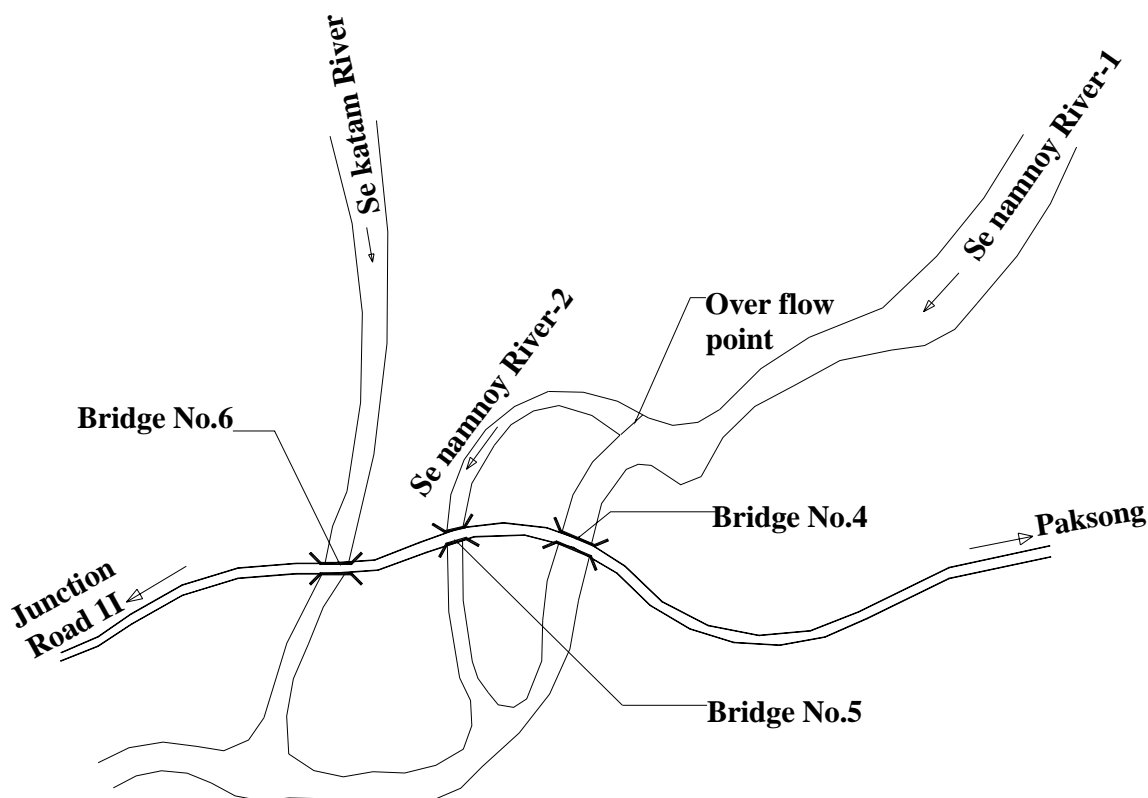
Plan Sketch of Bridge No.4, No.5 & No.6
